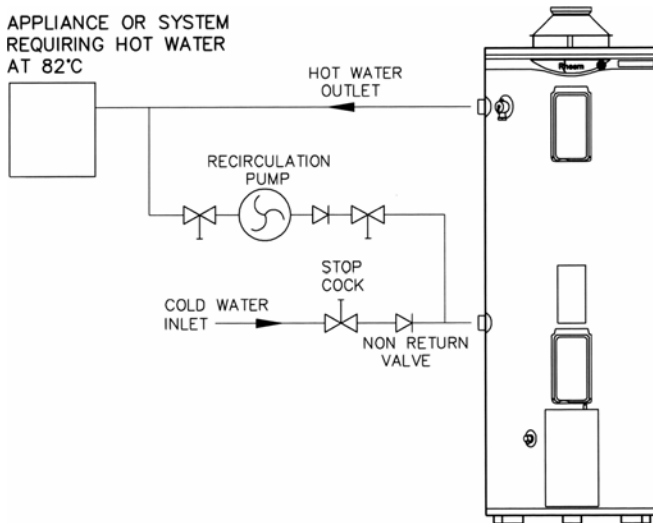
Typical installation for 265 and 275 model providing hot water at a constant 82°C
